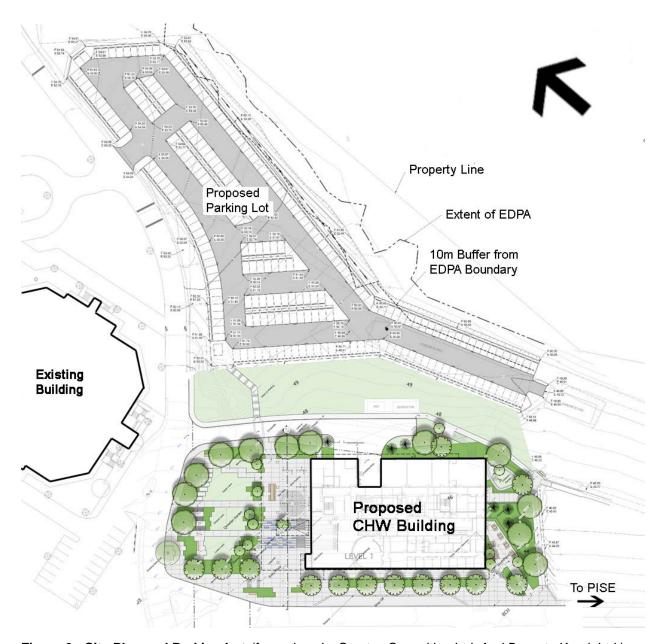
Site Plan and Parking Lot (from plans by Stantec Consulting Ltd. And Durante Kreuk Ltd.)
